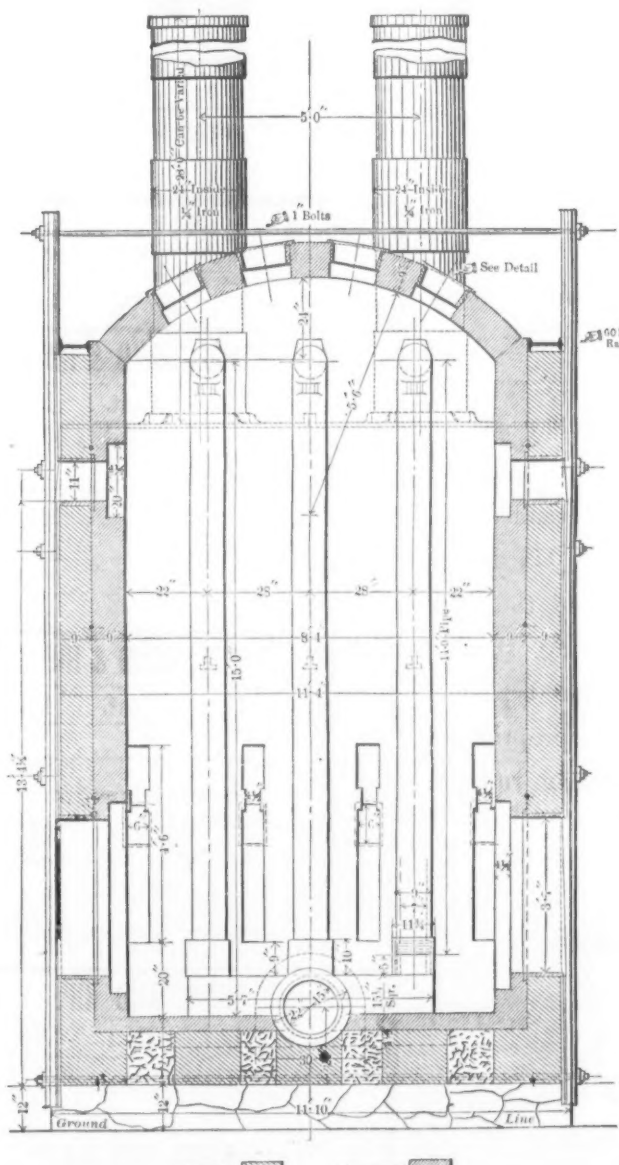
Sectional View.—Scale, 1/4 Inch to the Foot.
